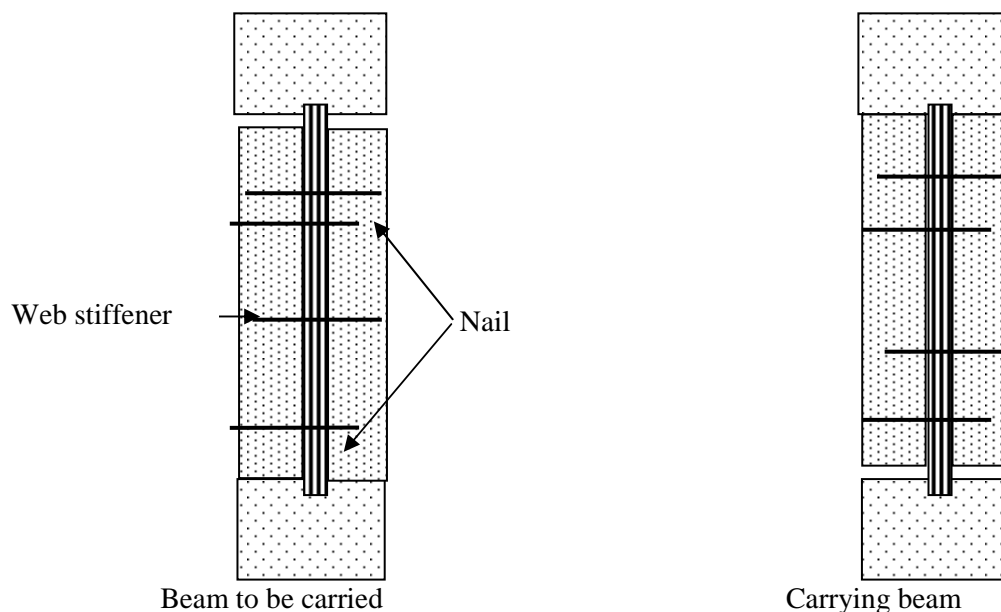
Web stiffeners on the beam at the cantilever bracket. The web stiffener shall fit to the bottom flange and have a width of 2/3 of the height between the inner sides of the flanges.
